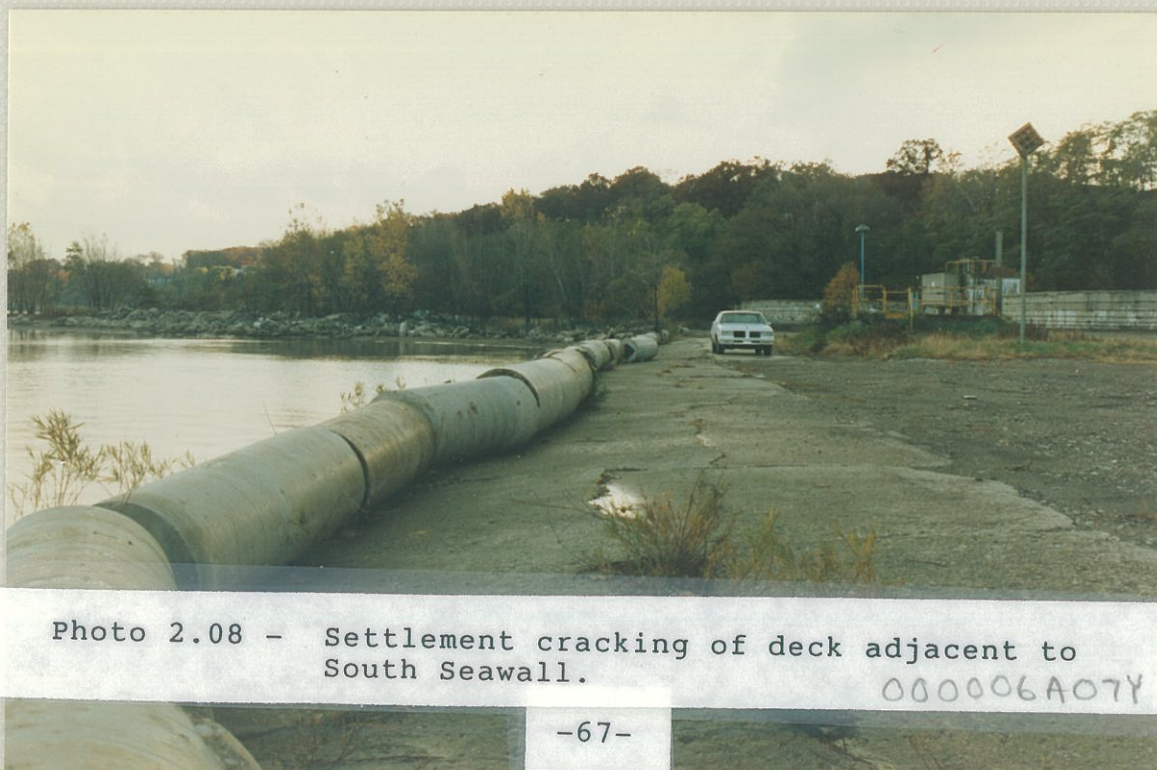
Settlement cracking of deck adjacent to South Seawall.
